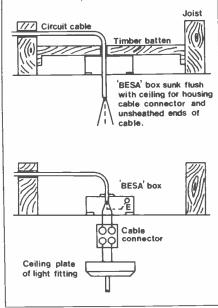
Fixing a light pendant fitting other than a ceiling rose.
